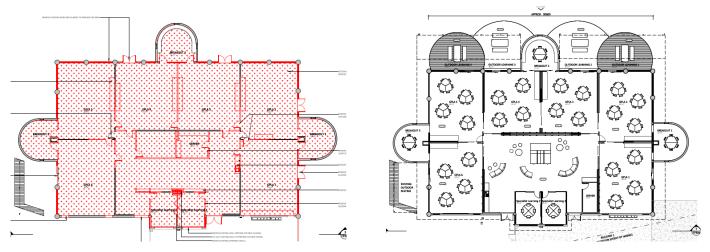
Building 2 – Internal demolition plan (left) and proposed classroom layout (right)
